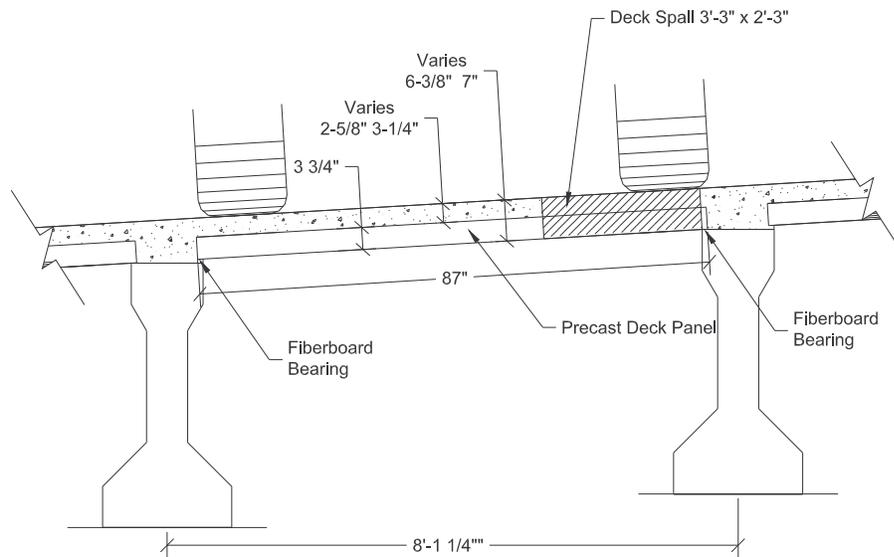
Deck Thickness Measurements and Details of Failed Section. Bridge # 100332, Span 38
